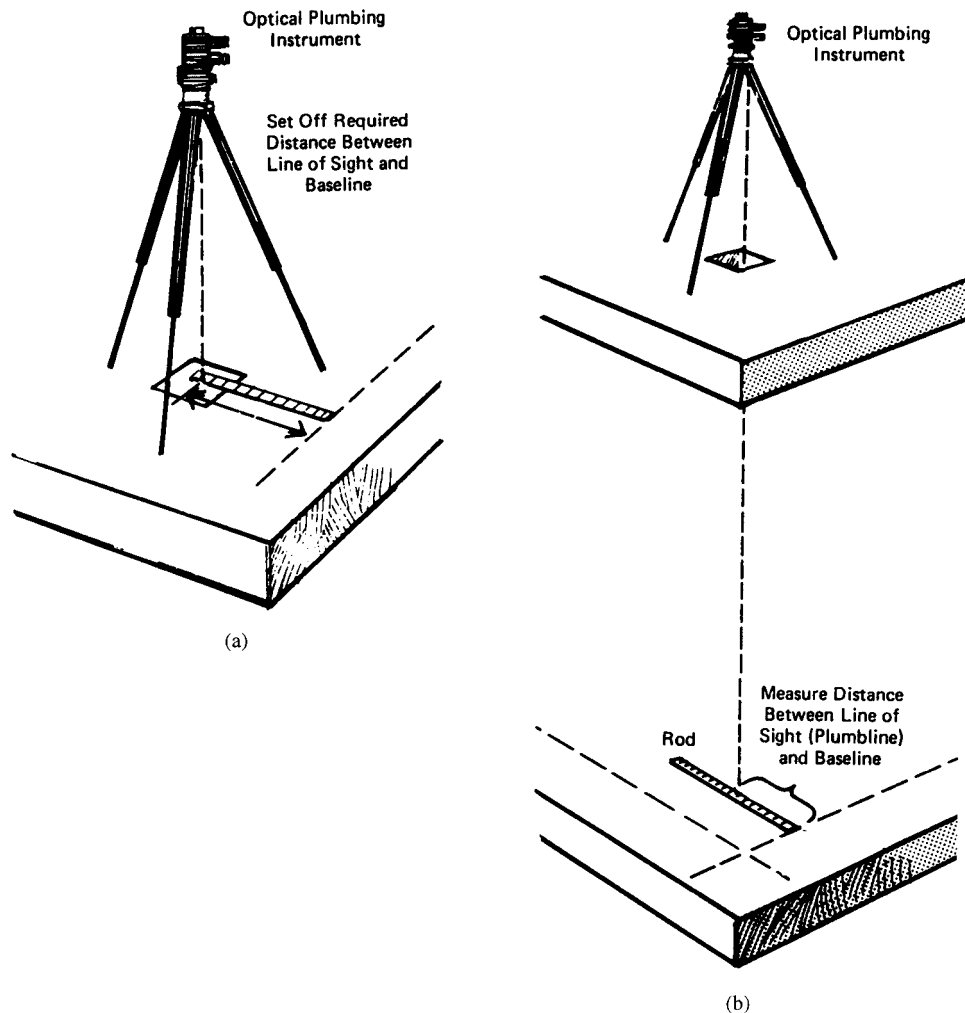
Downward eccentric plumbing with an optical plummet. (a) Orientation to lower floor. (b) Transfer lower floor position to instrument station floor. See Figure 14.19 for optical plummet. (Courtesy of the National Swedish Institute for Building Research)
